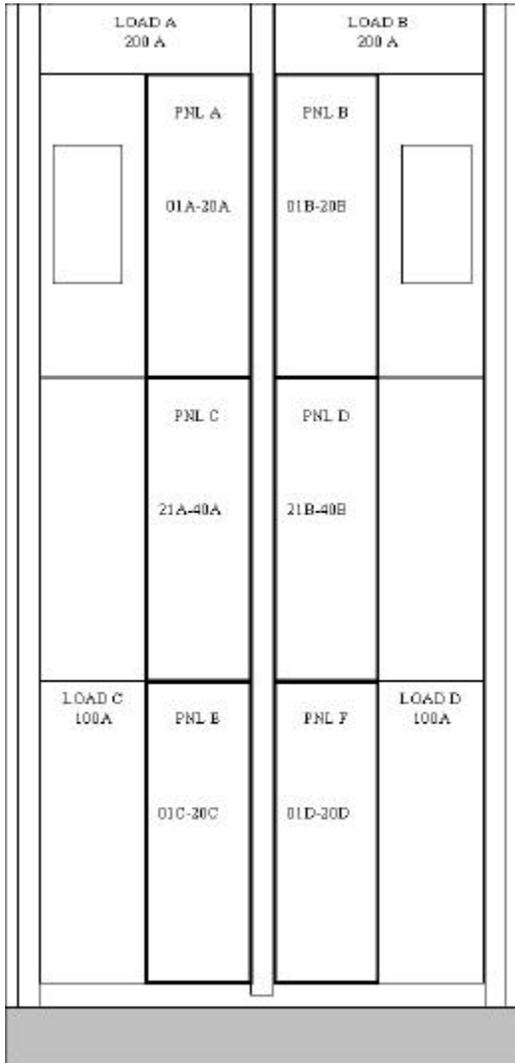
Typical Layout of 4 Load 400 Ampere BDFB
